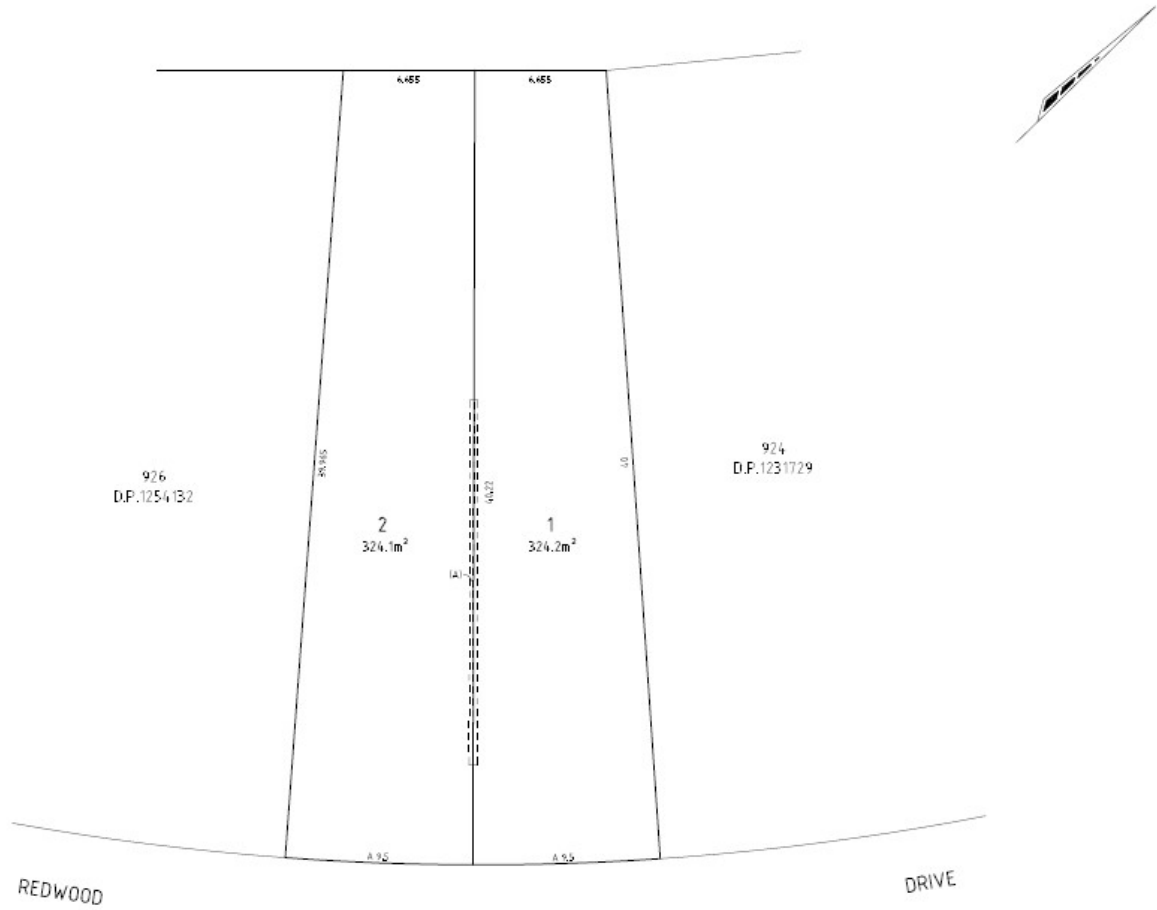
Proposed subdivision of site - 94 Redwood Drive (deWitt Consulting)
